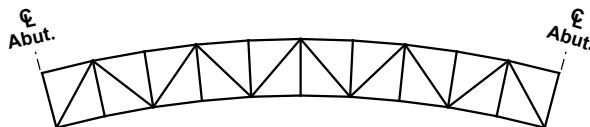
Warren-type Single-diagonal Top Lateral Bracing System for Tub Section Member: Plan View
